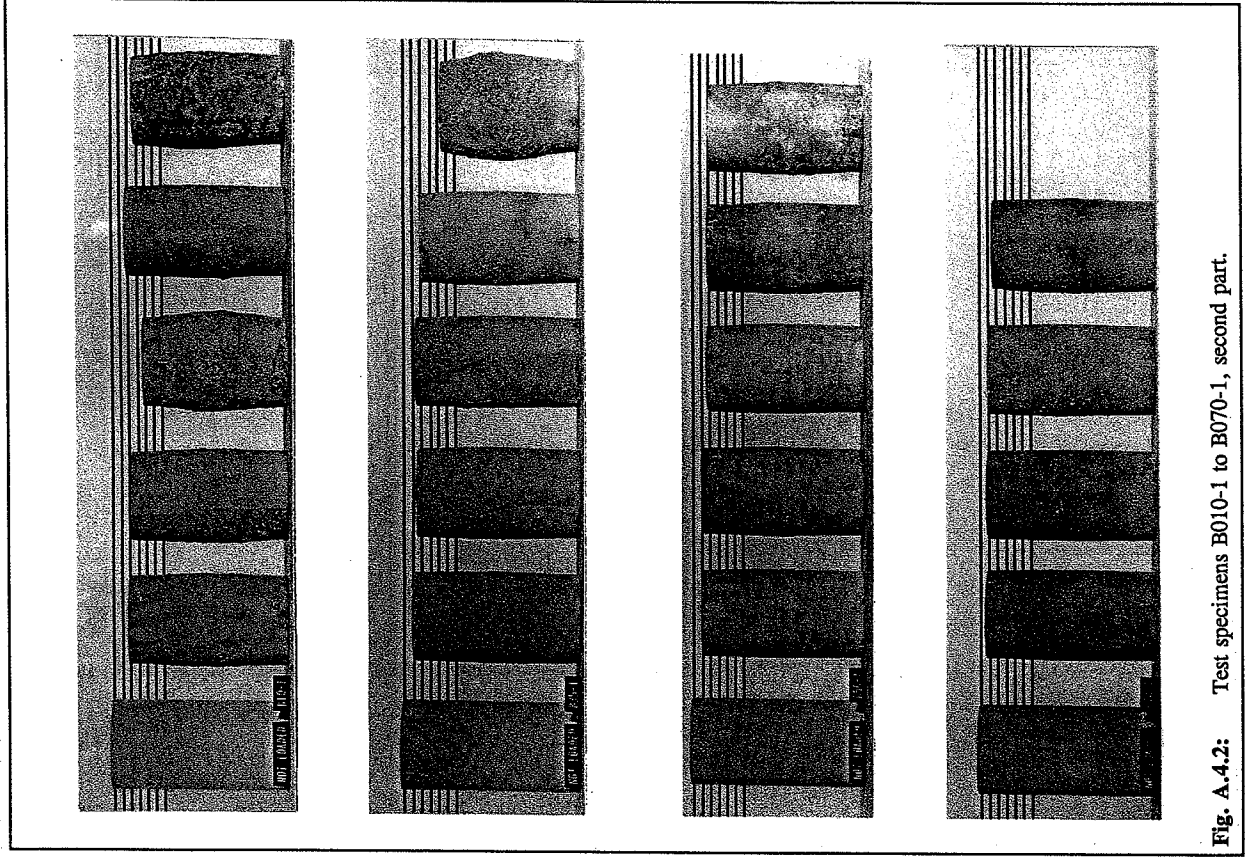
Test specimens B010-1 to B070-1, second part.
